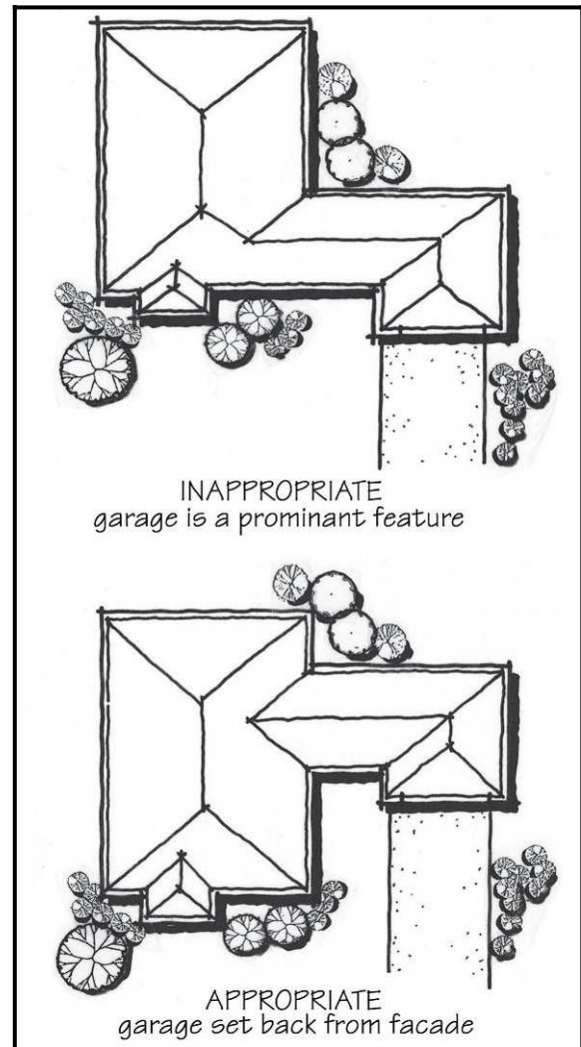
When garages face the street, set back the garage face from the primary facade
